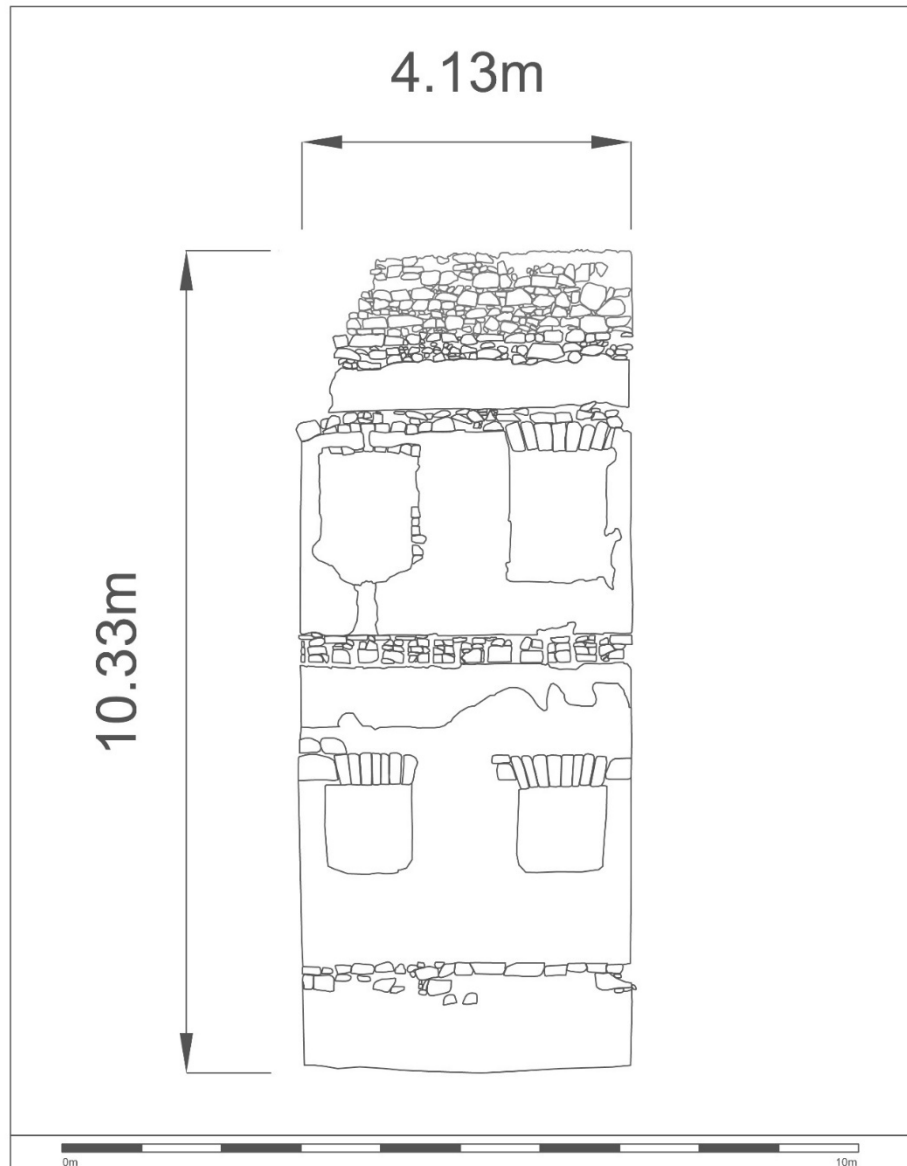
Internal elevation of the south-west wall of the signal tower at Mullaghderg Hill Signal Station.
